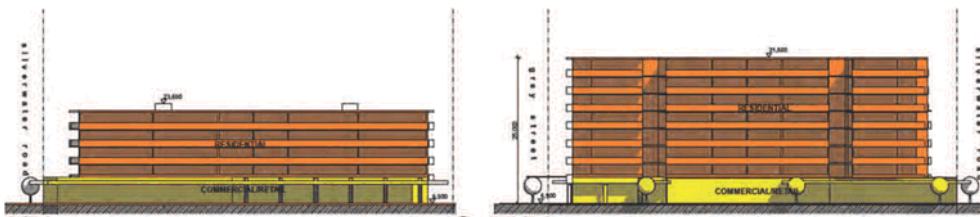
Carnarvon (left) and Bligh Street (right) Concept Elevations
